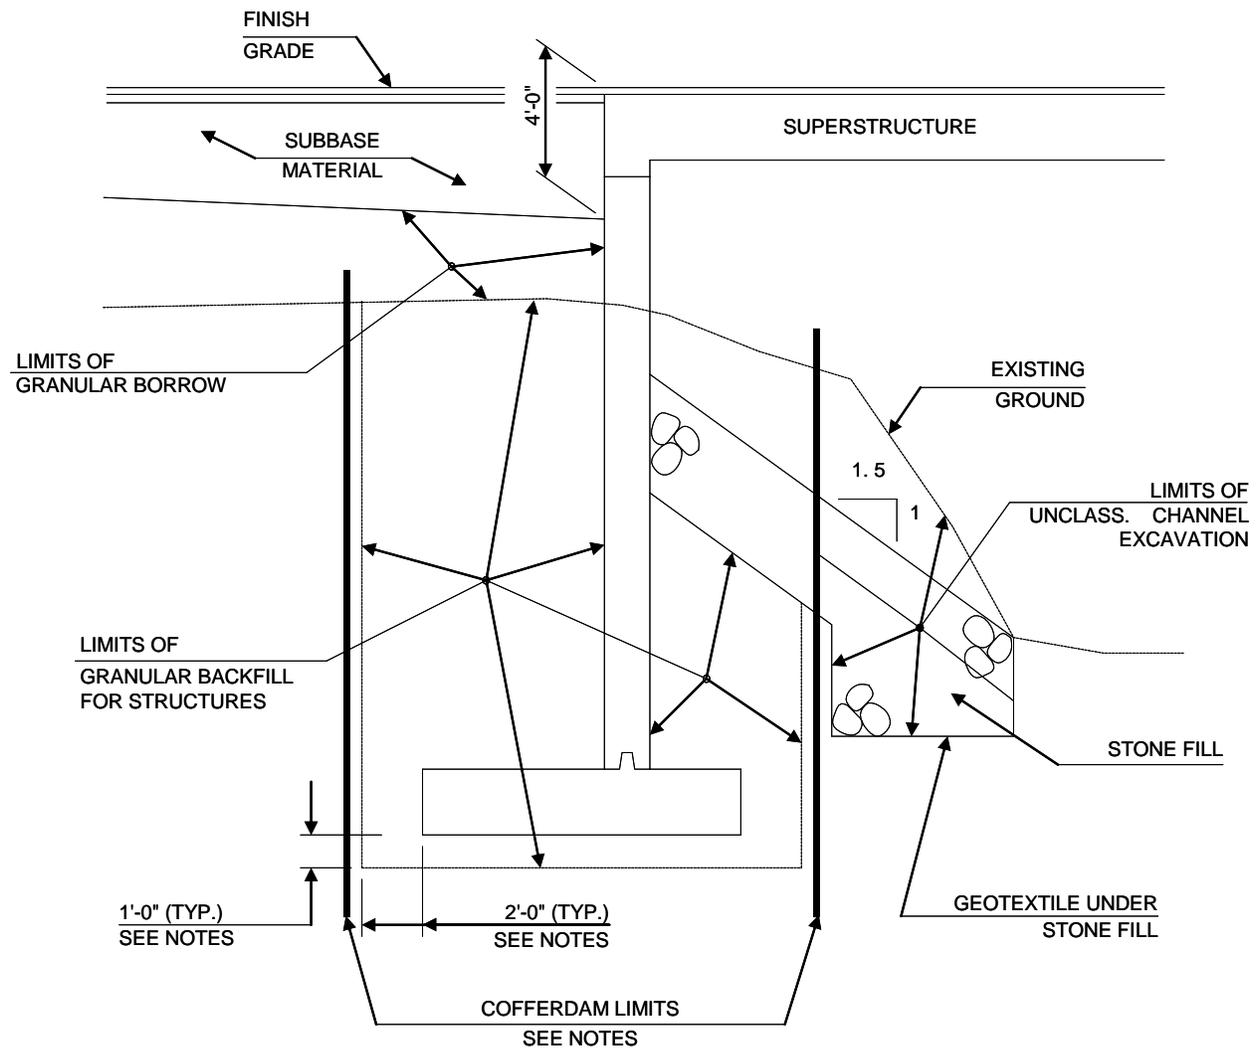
Typical Abutment Section Showing Cofferdam
